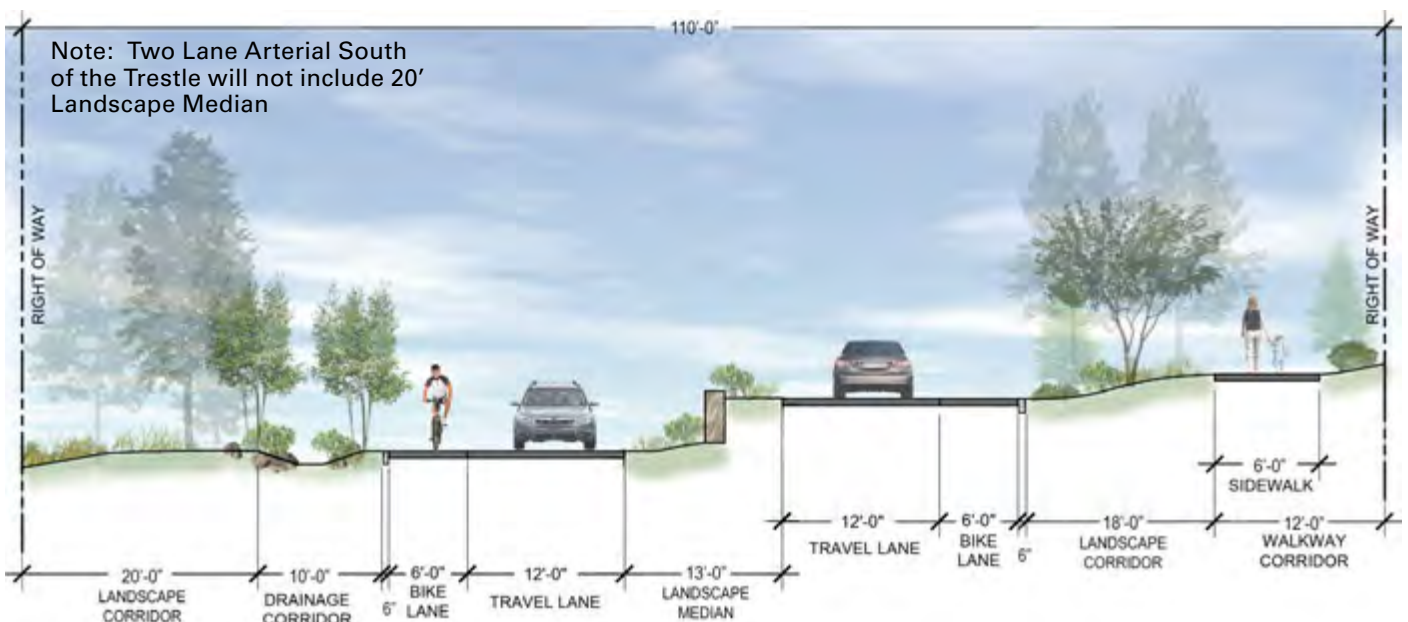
Typical Two Lane Arterial Parkway Section and Plan
